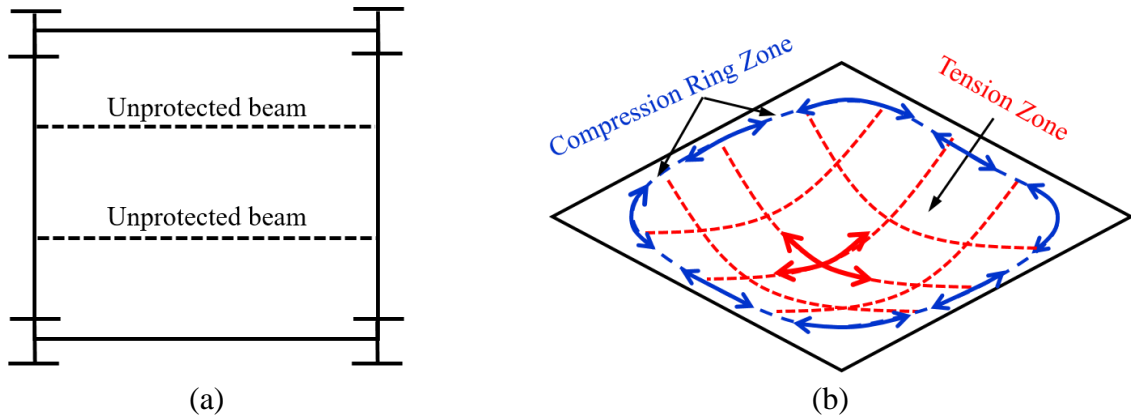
Tensile membrane action (TMA) in a heated steel-concrete composite floor panel: (a) plan view of a partially-protected slab panel; and (b) tension zone and compression ring zone developing under TMA. Figures adapted from [146]
